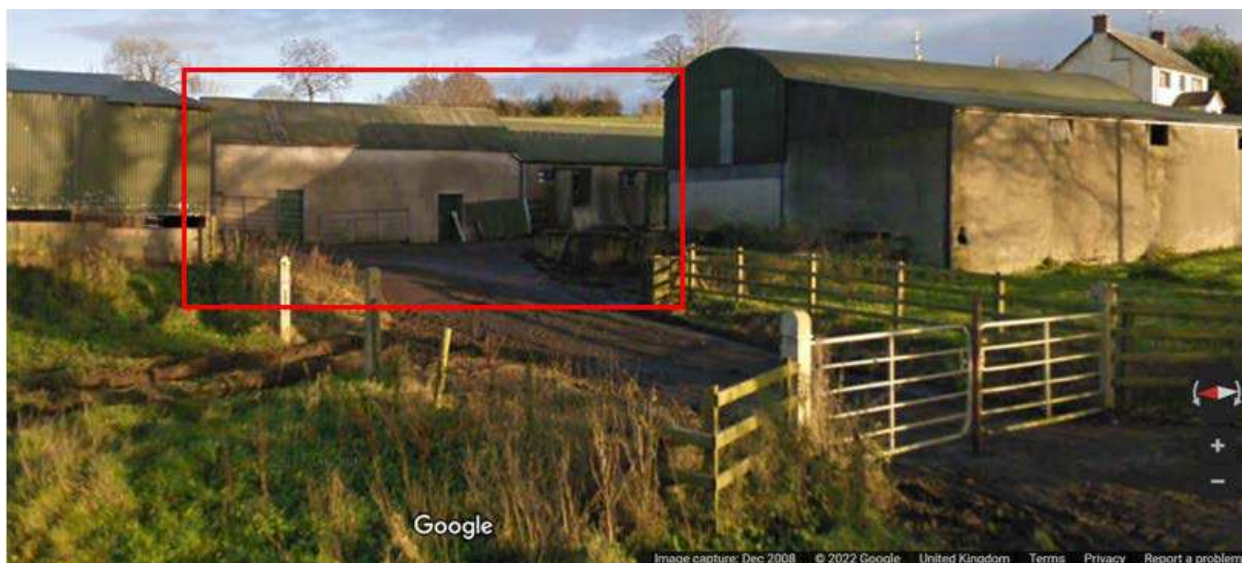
Google image of building as it stands today on site captured in December 2008. The surrounding agricultural building have since been removed and no. 92 Lisaclare Rd the associated dwelling see above to the northeast corner is in the process of being replaced under a recent planning permission.
